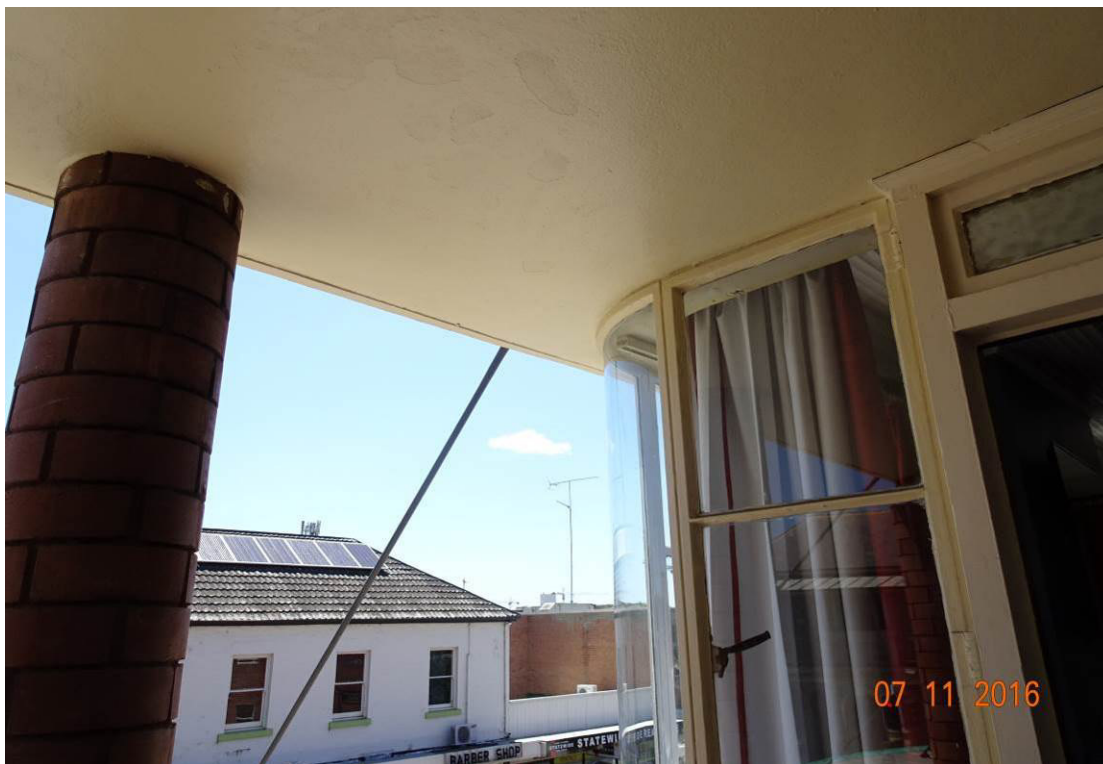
First Floor Verandah: Brick column, curved window and slab soffit
